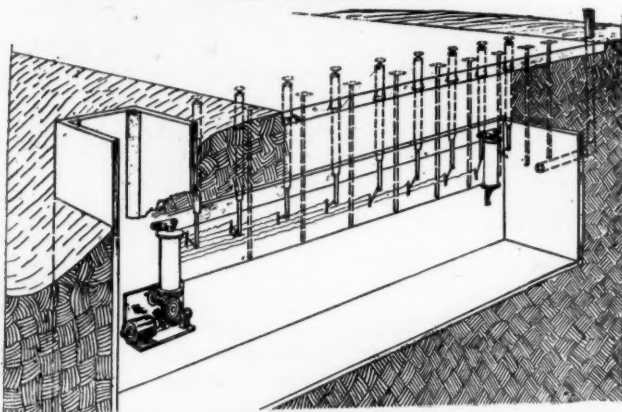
SECTION OF TUNNEL, SHOWING APPARATUS INSTALLED IN TUNNEL
